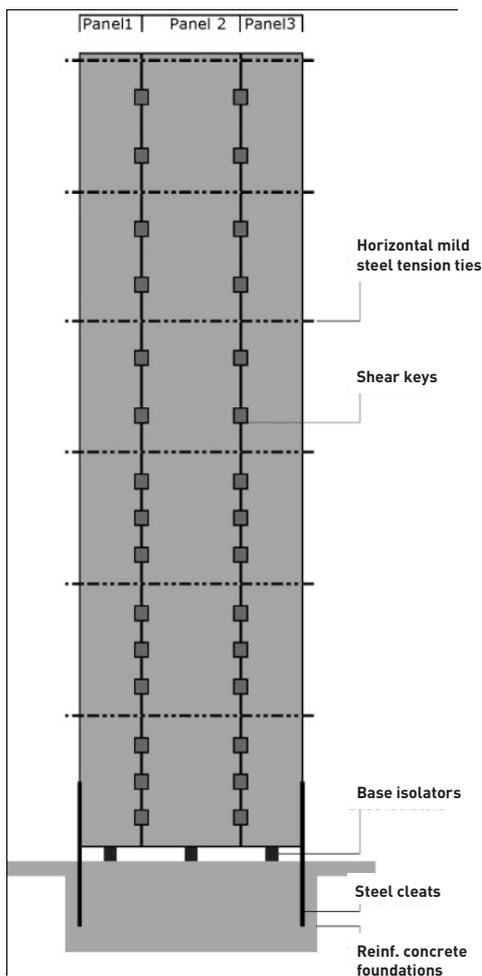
Elevation of 'shear wall' LLRS (diagrammatic)
